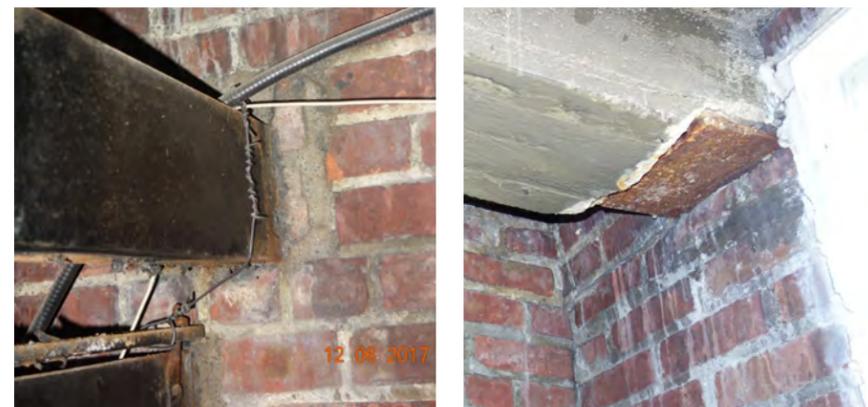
6 Hose Hoisting Steel (left), Concrete Encased Steel Beam (right)
